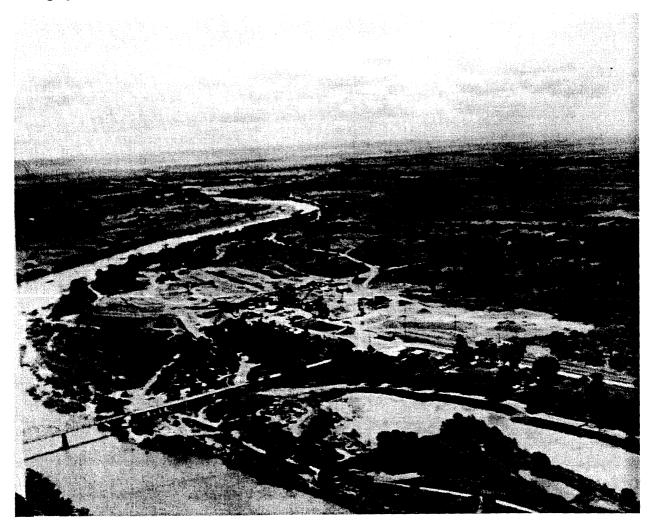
Old Fair Oaks Bridge, aerial view of the bridge, view from the northwest looking southeast, 1958, accession #77/24/51, Sacramento Archives and Museum Collection Center, Sacramento, California.
